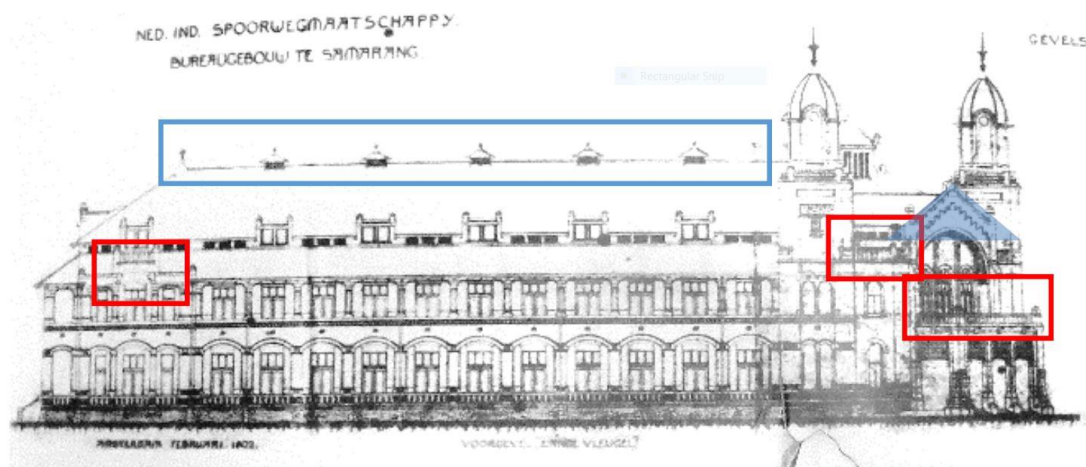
Balustrade, Gable, and Dormer on the Western Façade of the building A Lawang Sewu, 1917
